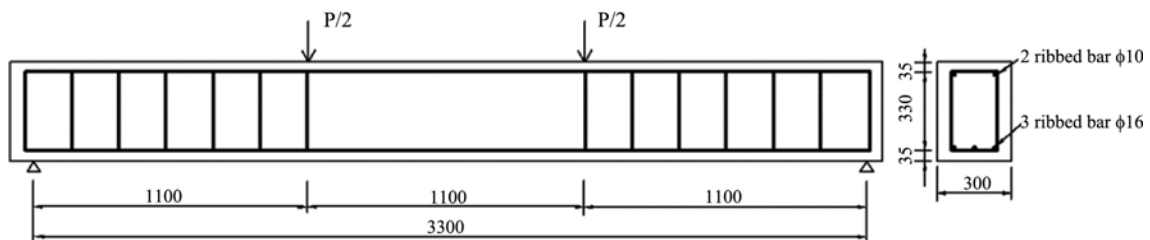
Layout of Test Beams Constructed by Castel et al. (2014) (unit: mm)
